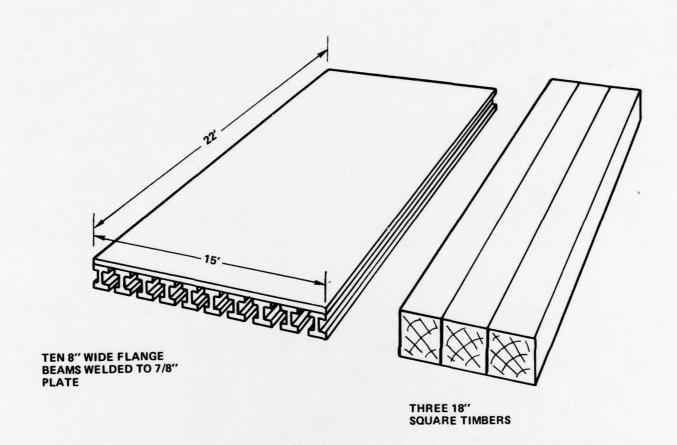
ALTERNATIVE HATCH BRIDGING BEAMS FOR CRANE TRAVEL
